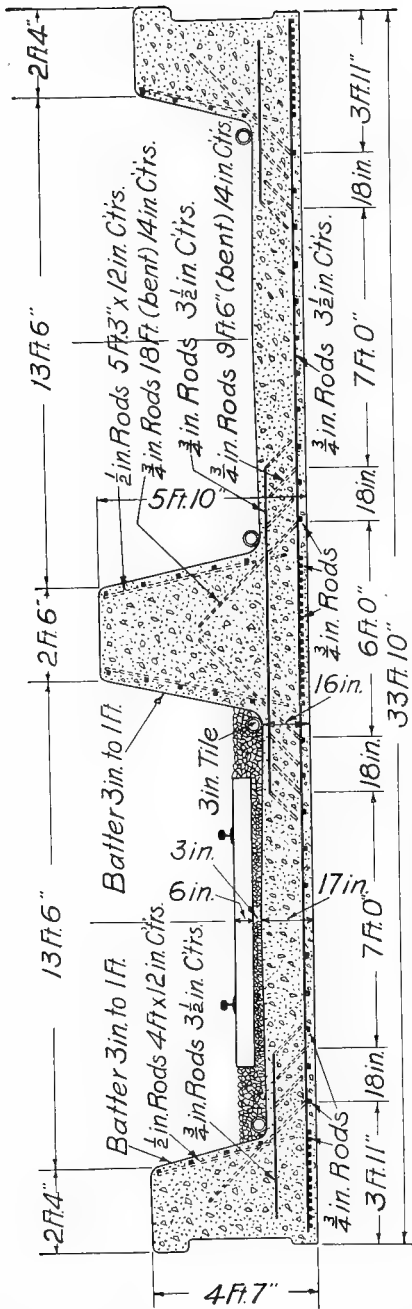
CROSS SECTION OF THROUGH GIRDER BRIDGE, C., B. & Q. R. R.
